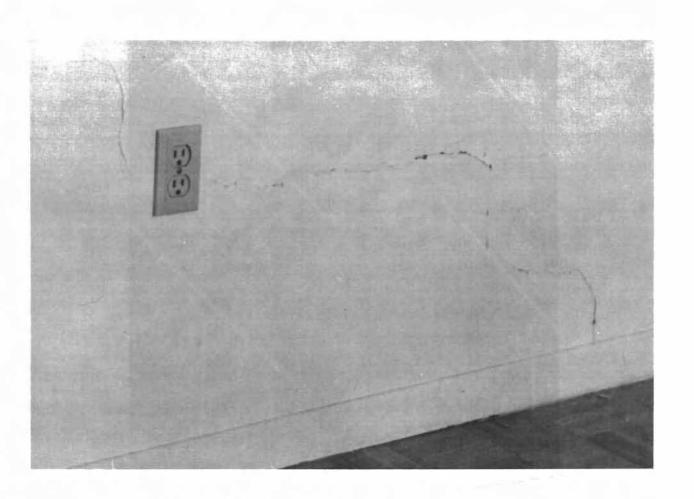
Cracking of concrete cross-wall (same apartment as shown in Figure 1).
